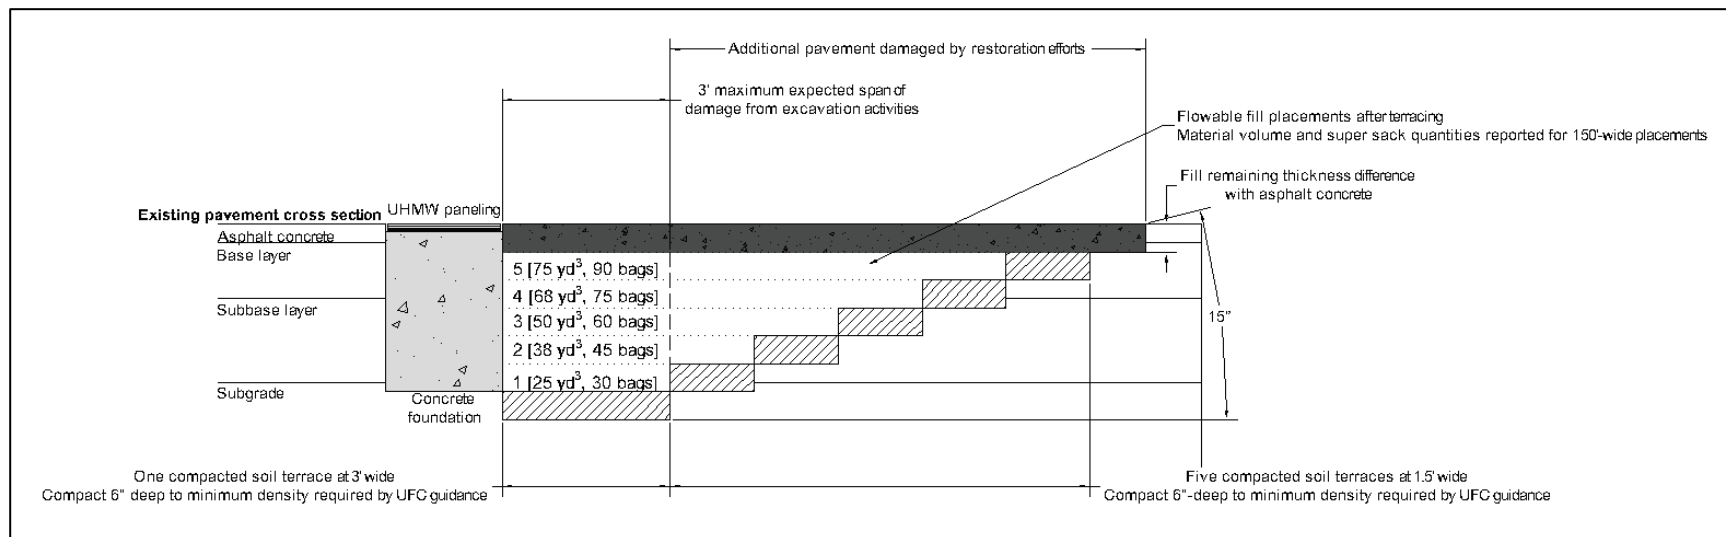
Prospective terracing plan for AC foundation installations with 18 in. terracing.
